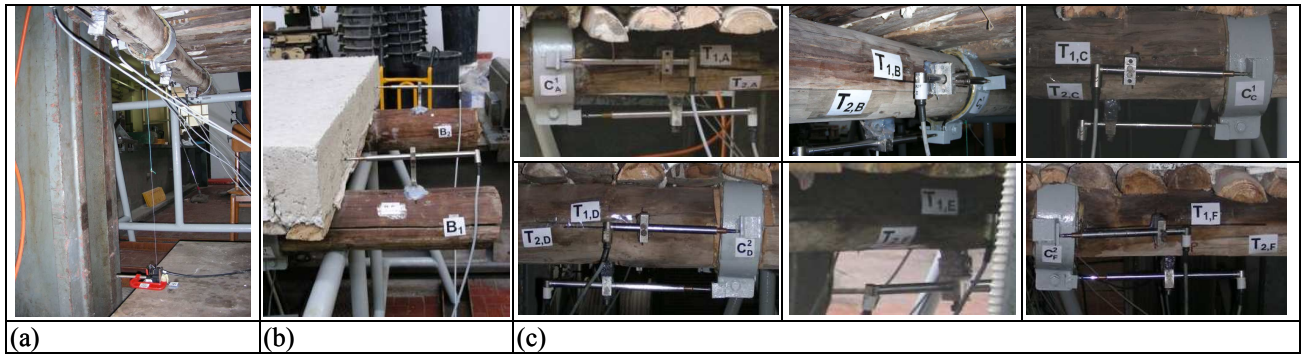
Transducers location: (a) Vertical transducers; (b) beam-to-slab transducers; (c) collar-beam transducers
